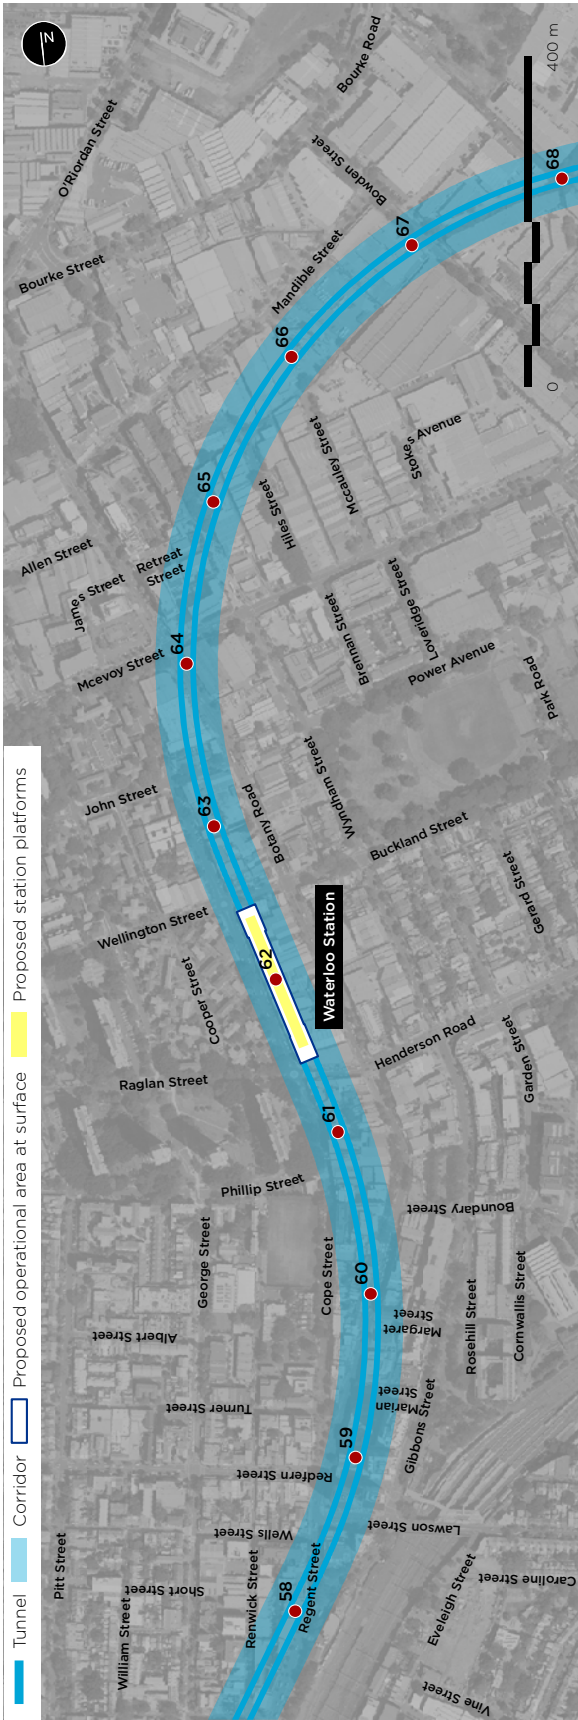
Indicative Chatswood to Sydenham alignment plan and long section
